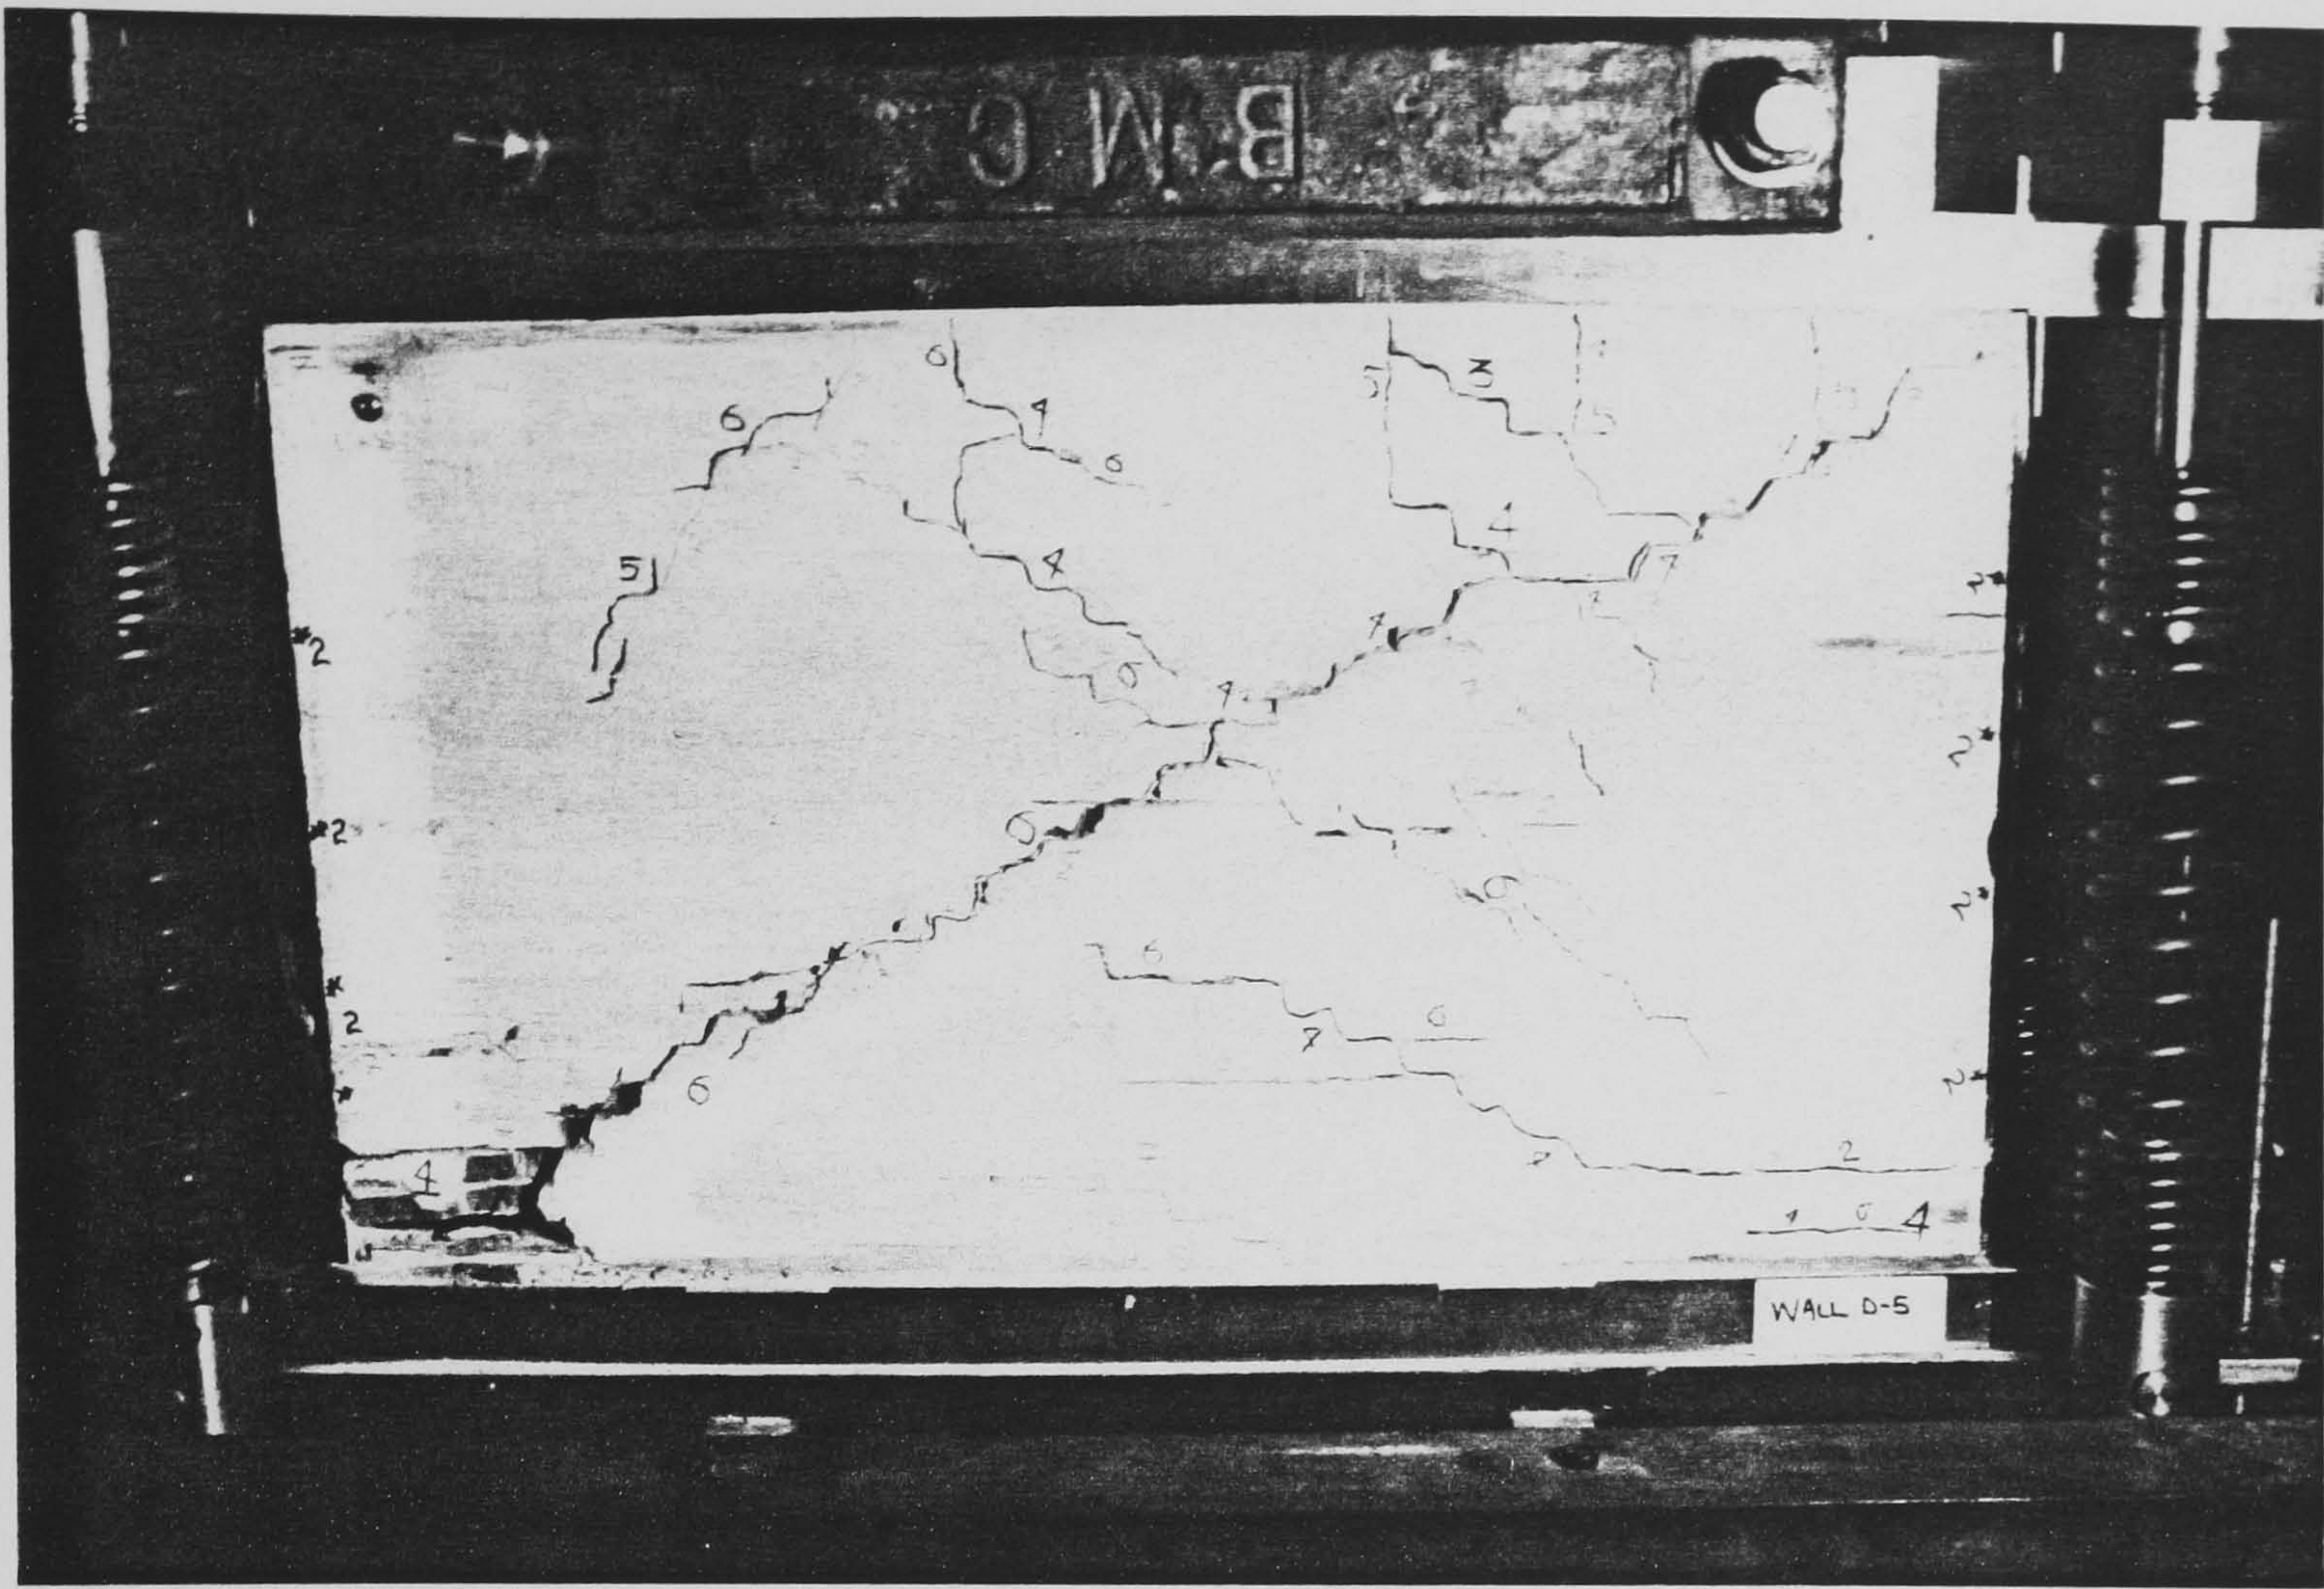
Collapse sequence-frame 3 (wall-D)
